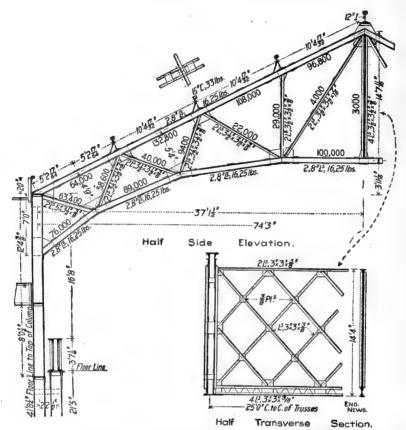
Roof Truss and Transverse Bent Showing Transverse Bracing.
